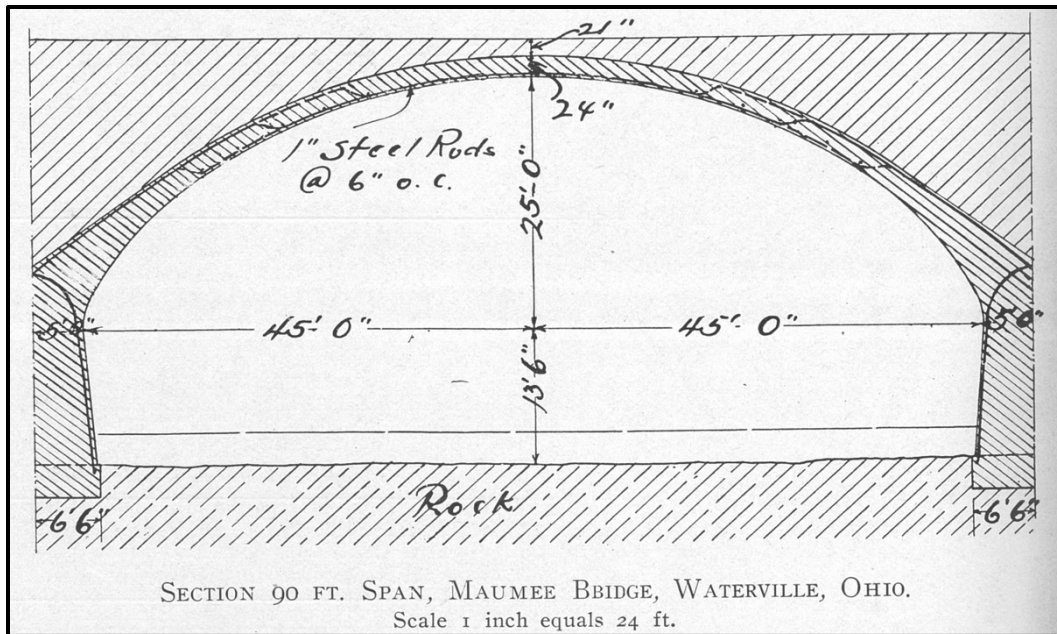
Typical Arch Reinforcement Placement, Roche de Boeuf Bridge (Spans 6 & 7 Shown)¹
